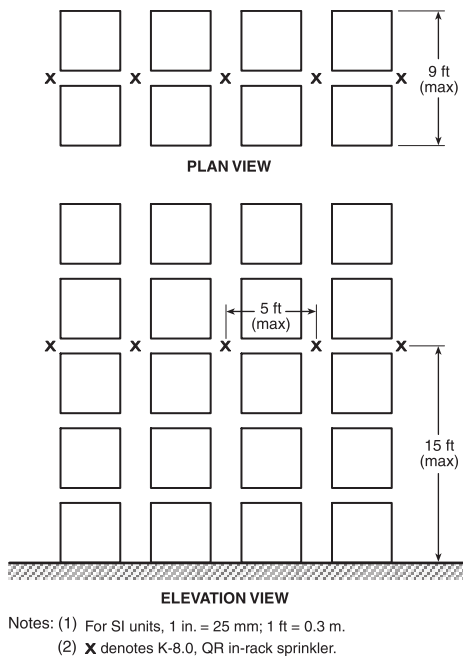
(c) Double-Row Rack Sprinkler Layout 8 — Option #2.
